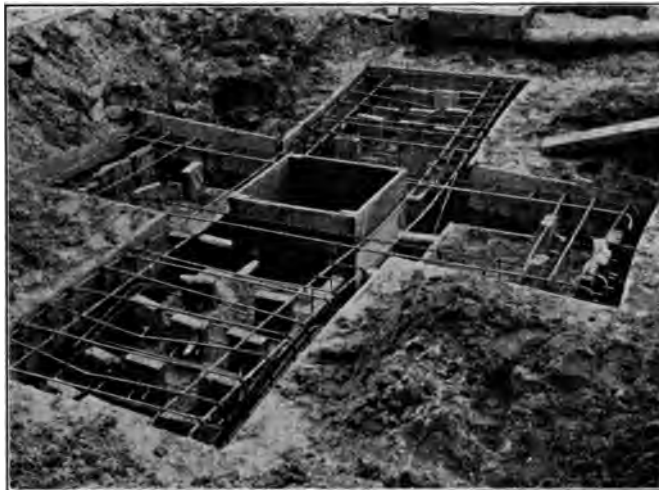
FOOTING FOR LAMP STANDARD, SHOWING REINFORCEMENT AND ANCHORAGE
